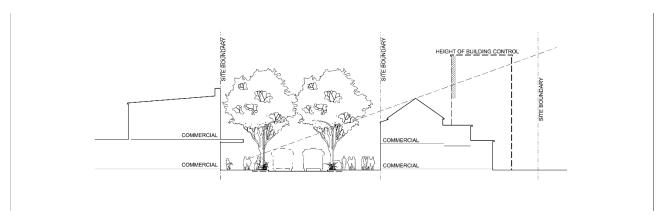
Street Cross Section - Regent Street Additions (Pitched roofs)
